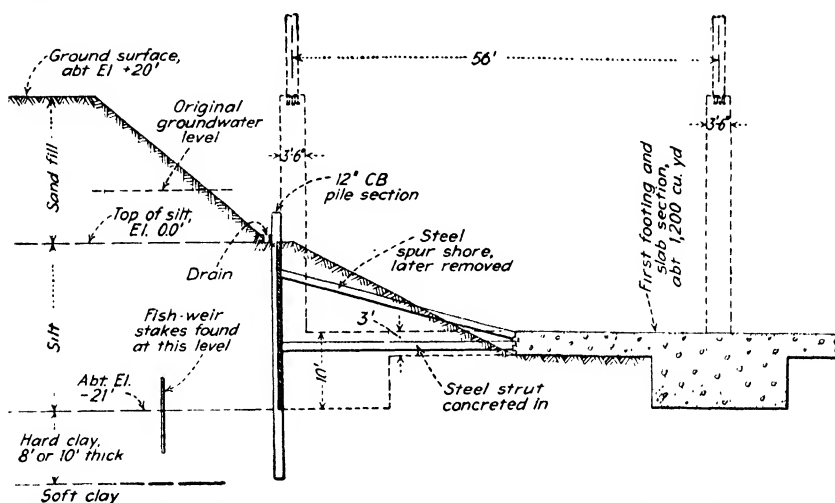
Foundation Construction Procedure for New England Mutual Life Insurance Co. Building in Boston.
